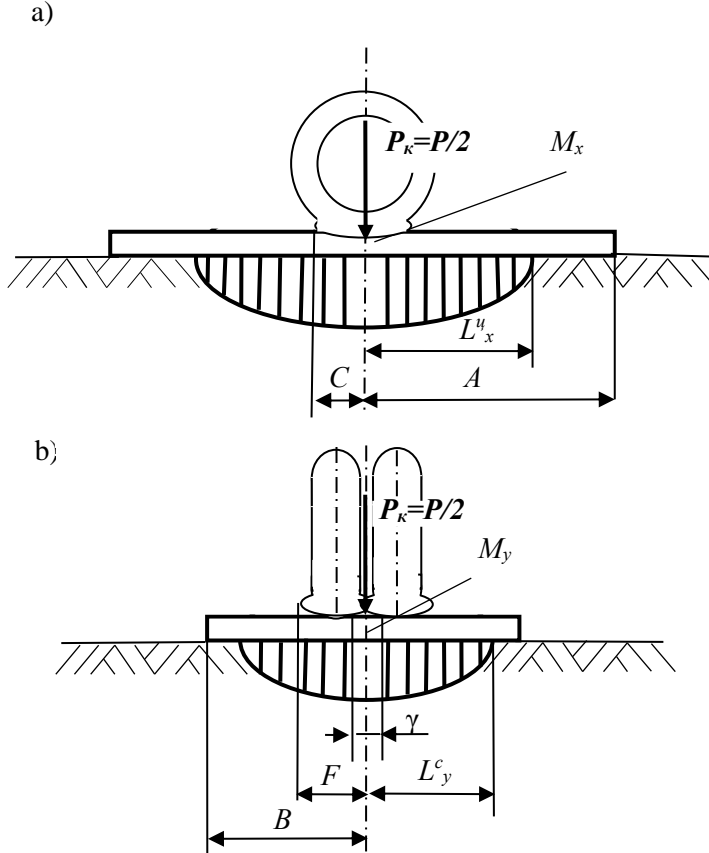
Design diagram of the MRRP slab stress for strip-type pavements; a) in the longitudinal direction; b) in the transverse direction.
